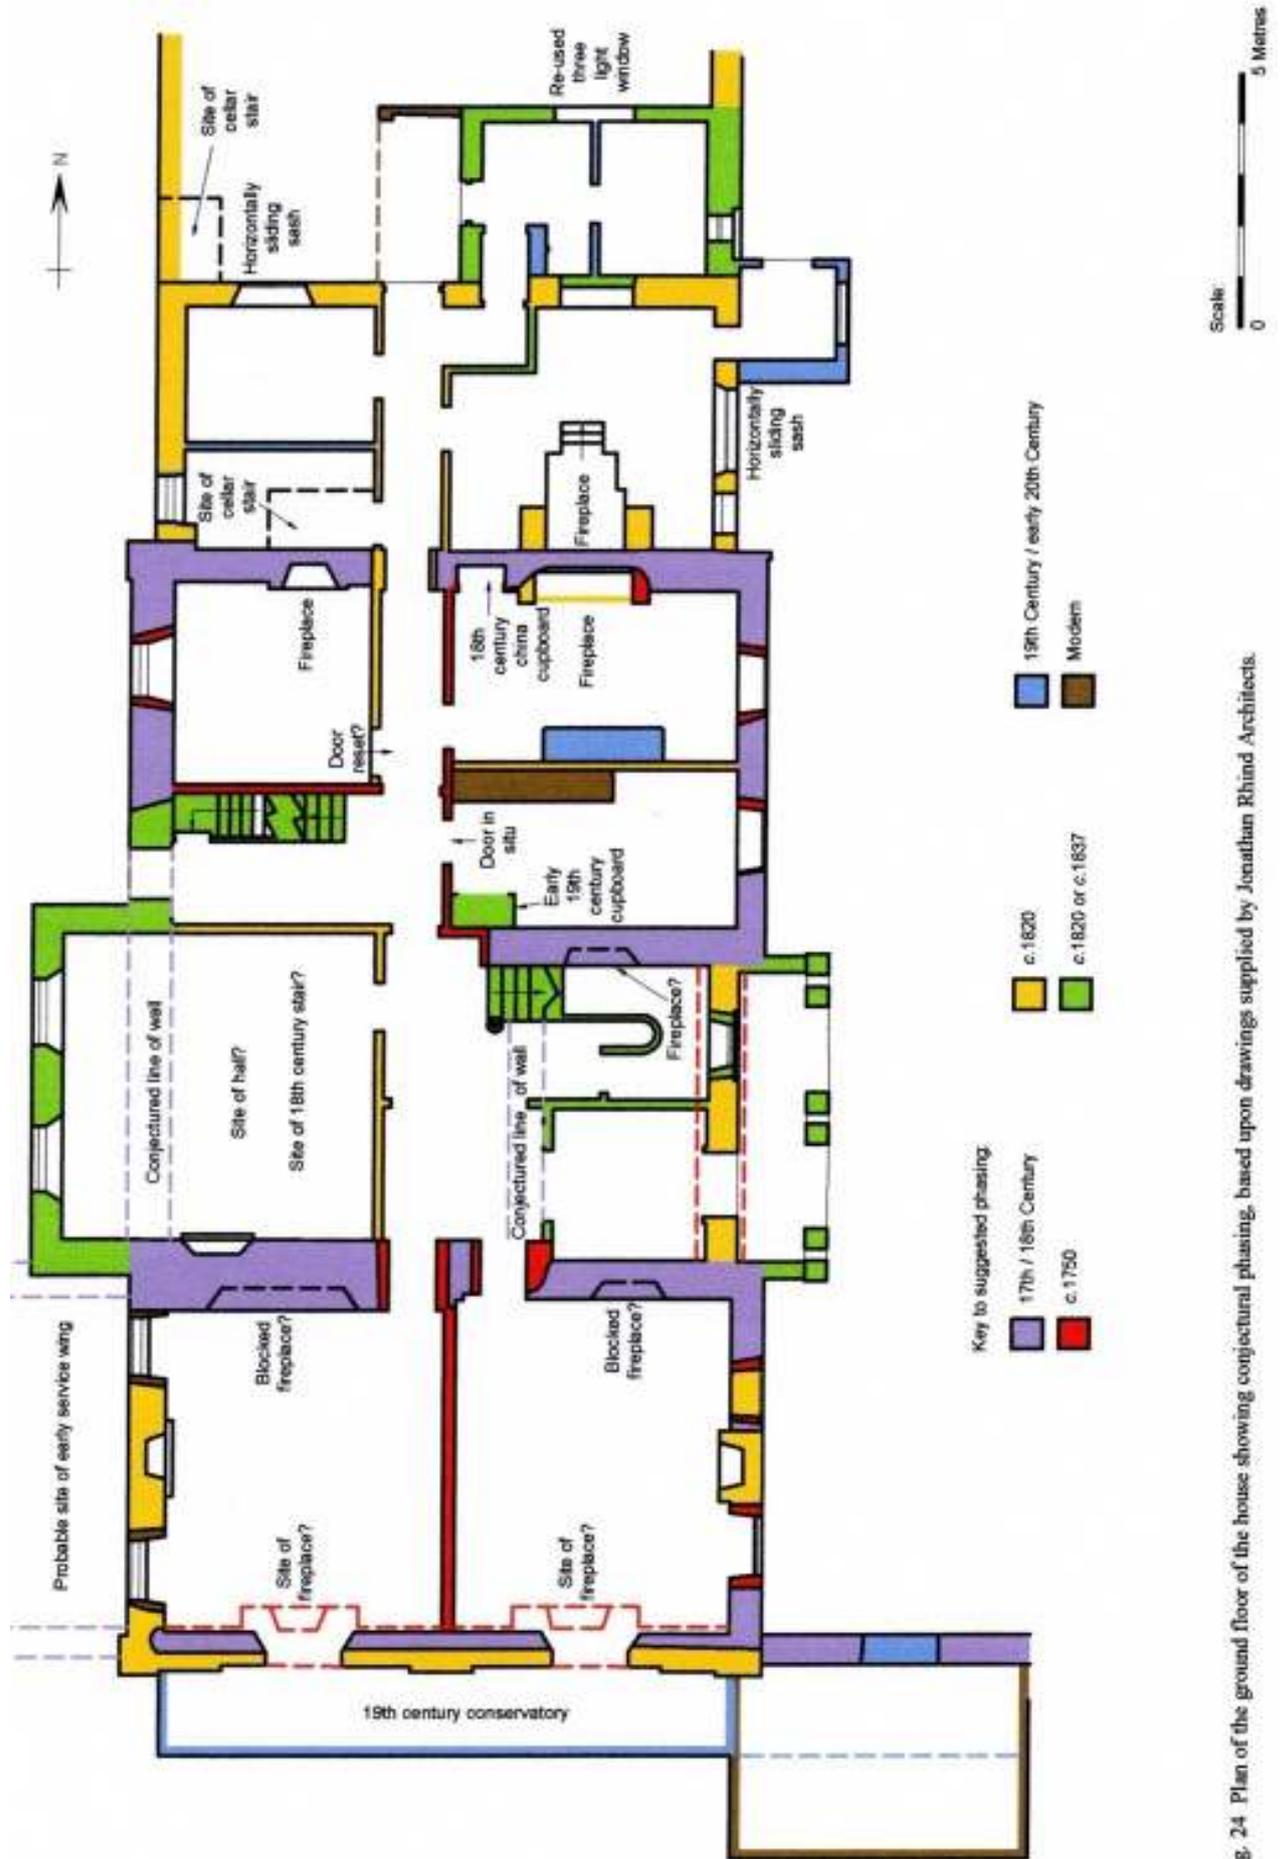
Plan of the ground floor of the house showing conjectural phasing, based upon drawings supplied by Jonathan Rhind Architects.
